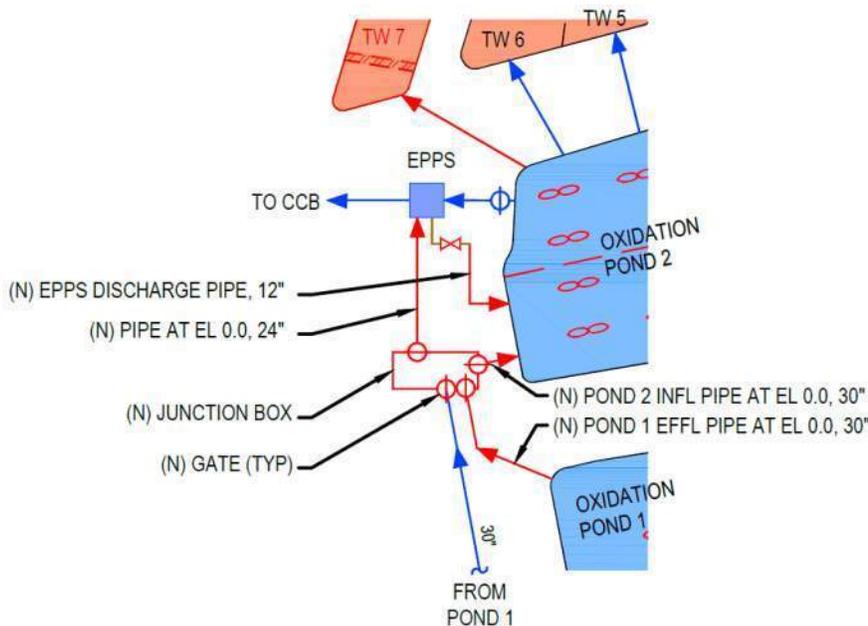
New Pond 1 and 2 Equalization Structures and Piping
